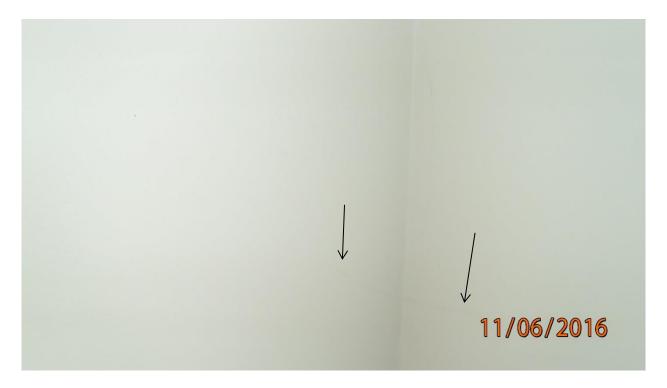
shows a crack to the mitre joint of the cornice in the south western corner of Bedroom 2.
